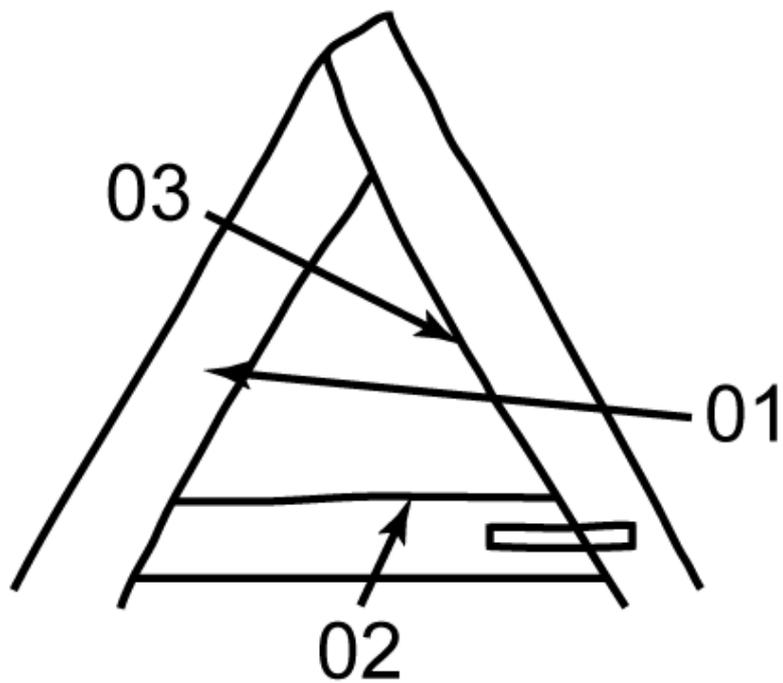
Cross-wing, truss 4, west face, showing the location of samples 01–03
